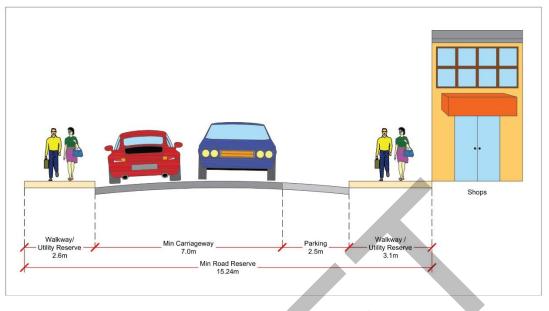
Cross-section of R-4 and R-5 roads.
